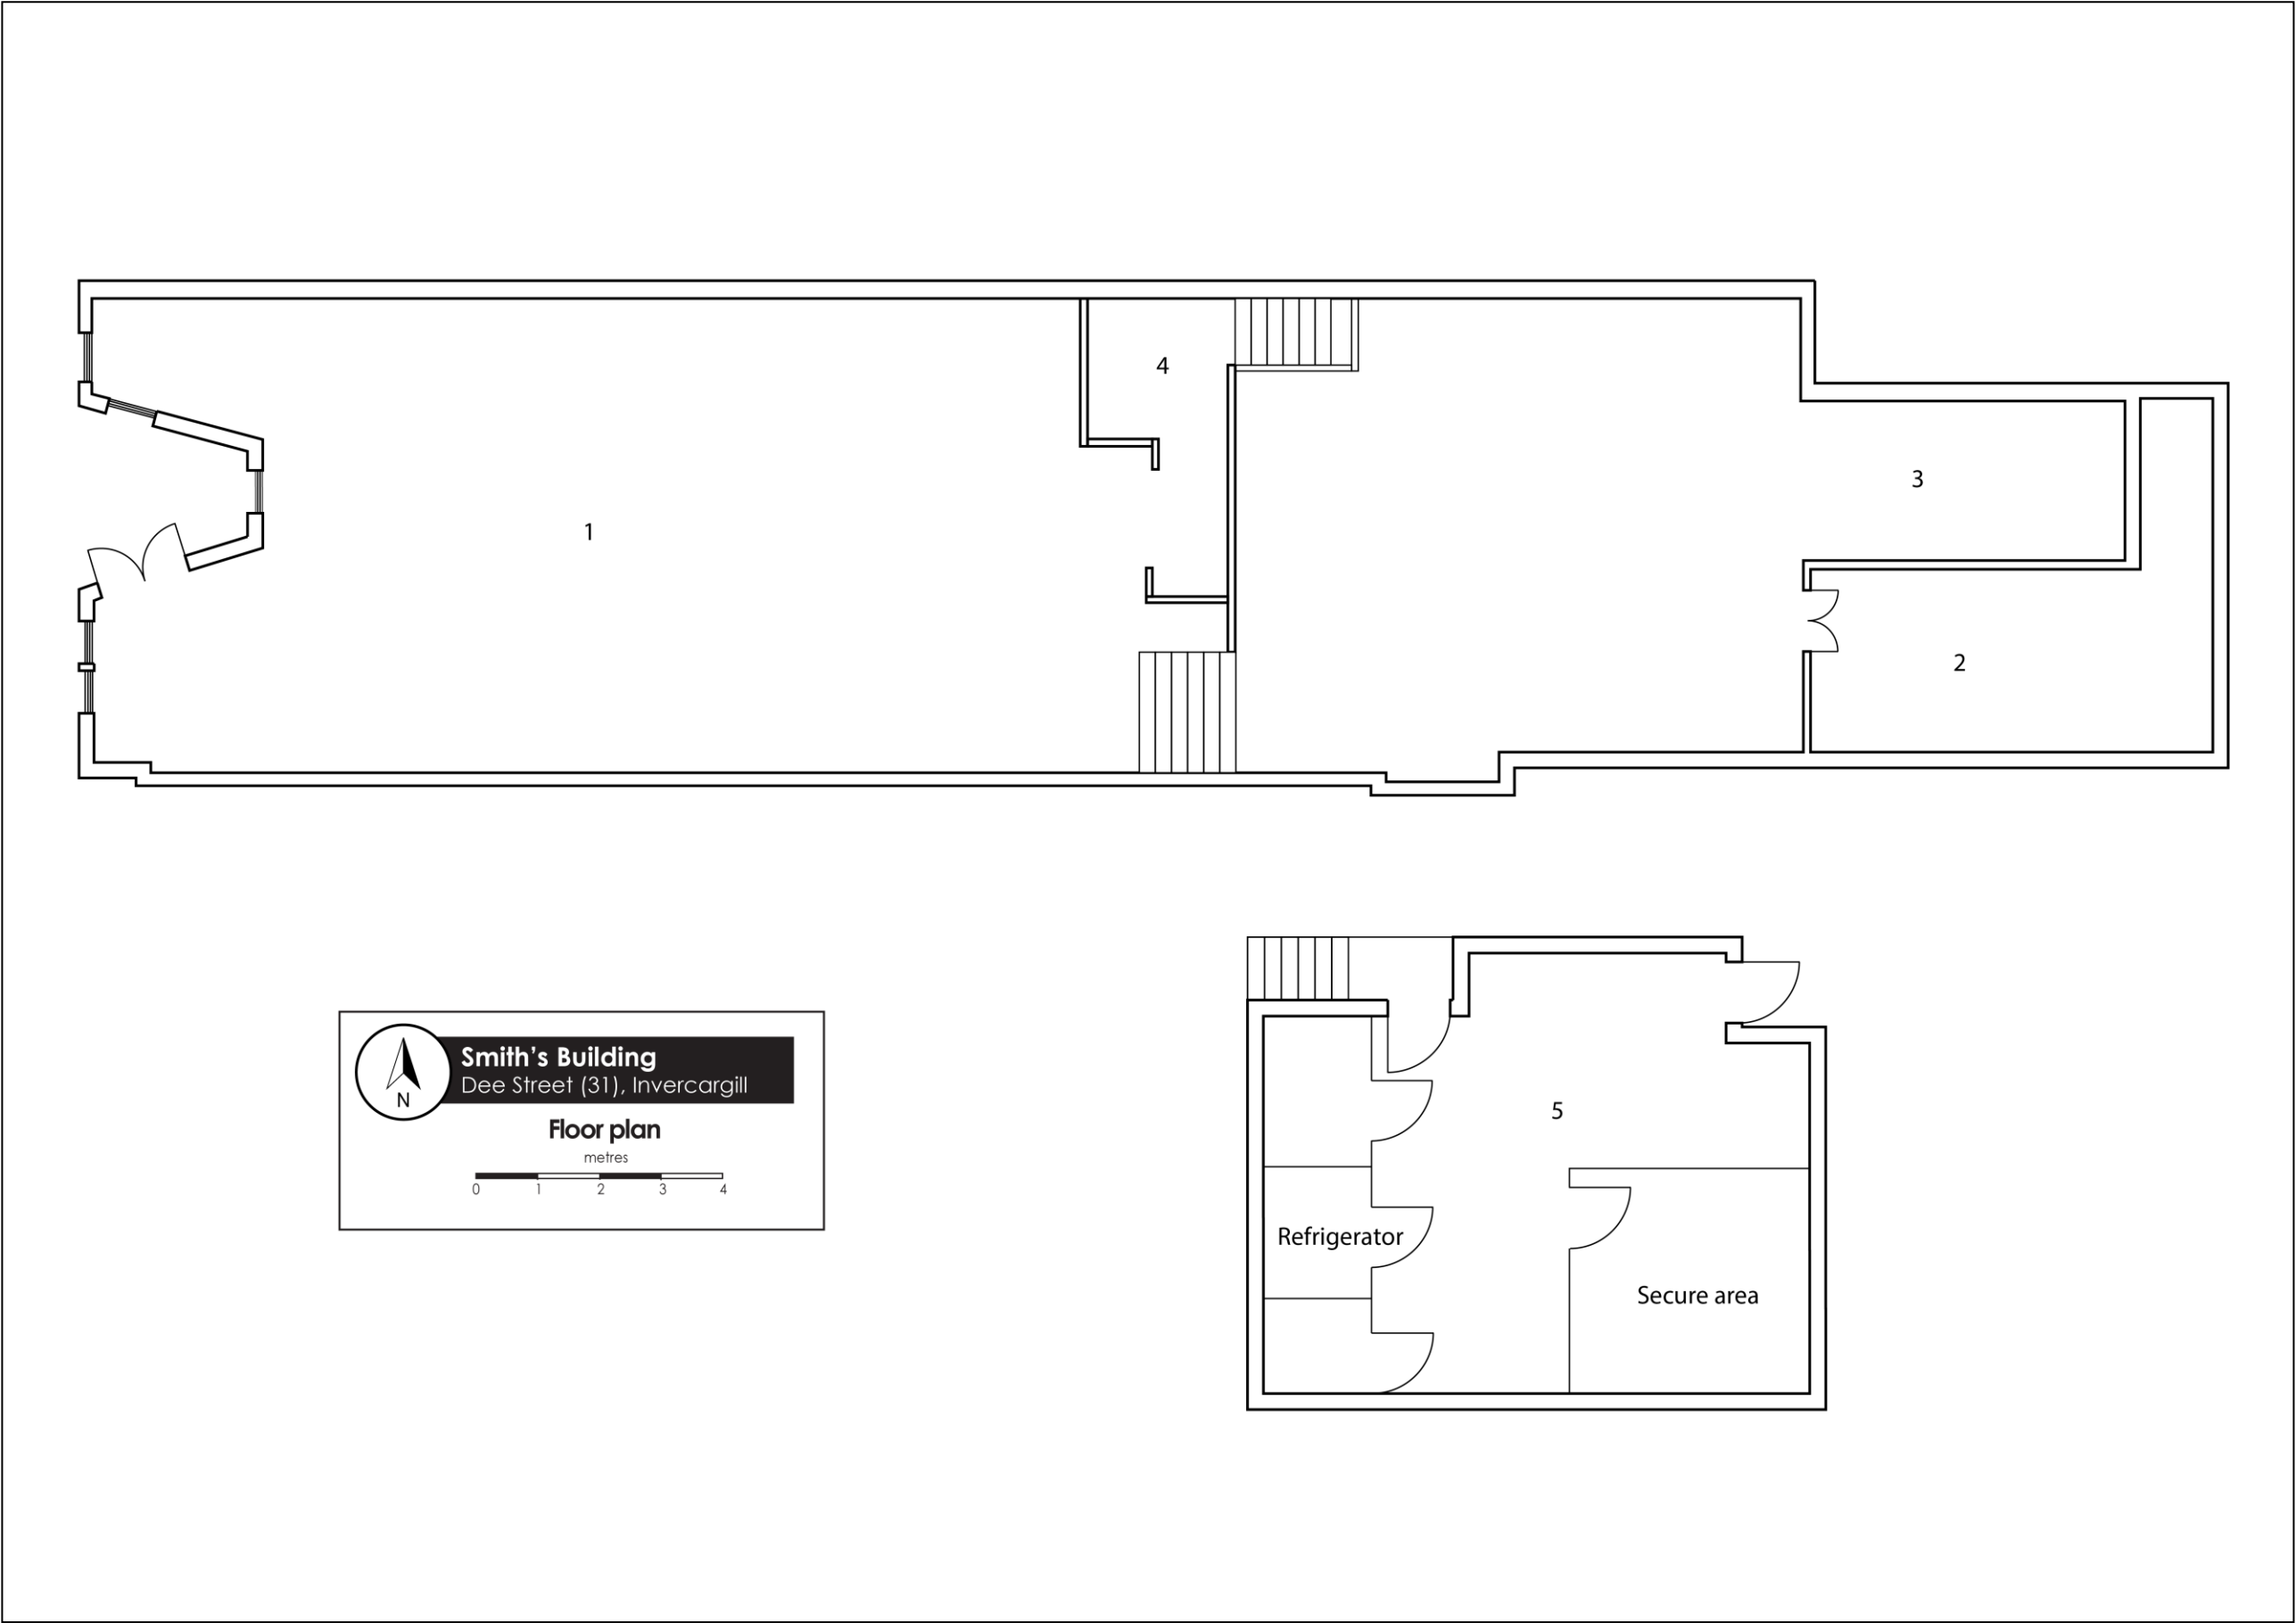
Ground floor (top) and basement (bottom) floor plans of Smith's Building.
